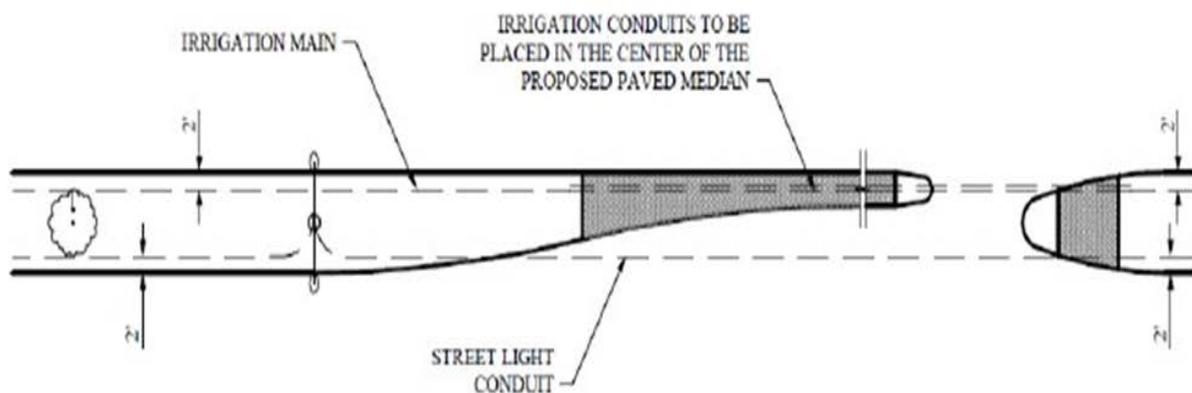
Conduit for Street Lighting and Irrigation
